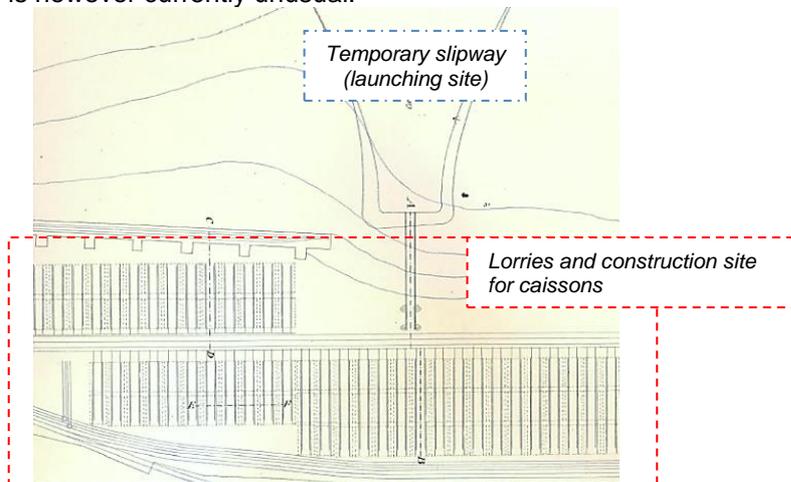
Execution plan of reinforced concrete caissons (half of the construction site)
